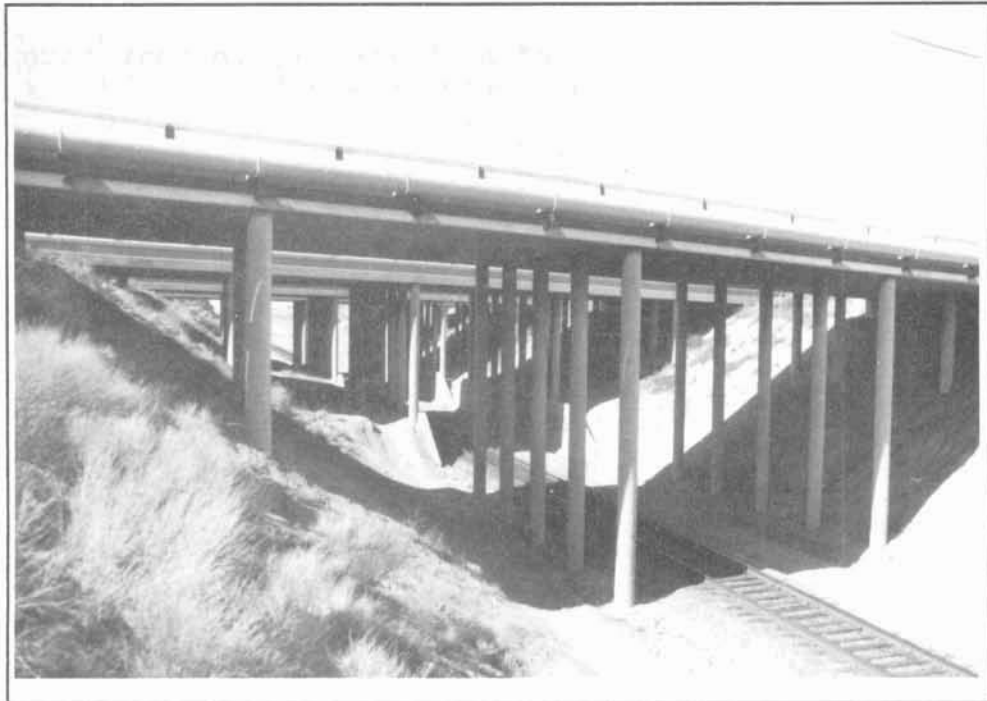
I-15 & Access Road Bridges Over the Southern Pacific Railroad
